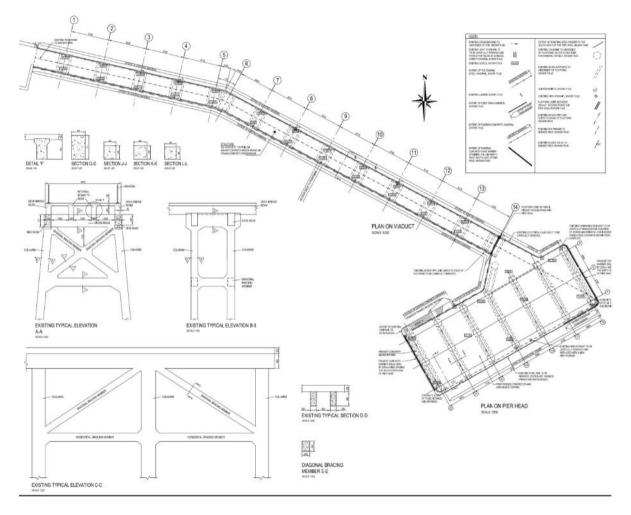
Pier Layout Extract from Rathmullan Pier Condition Report (Nicholas O' Dwyer Ltd. 2021)
